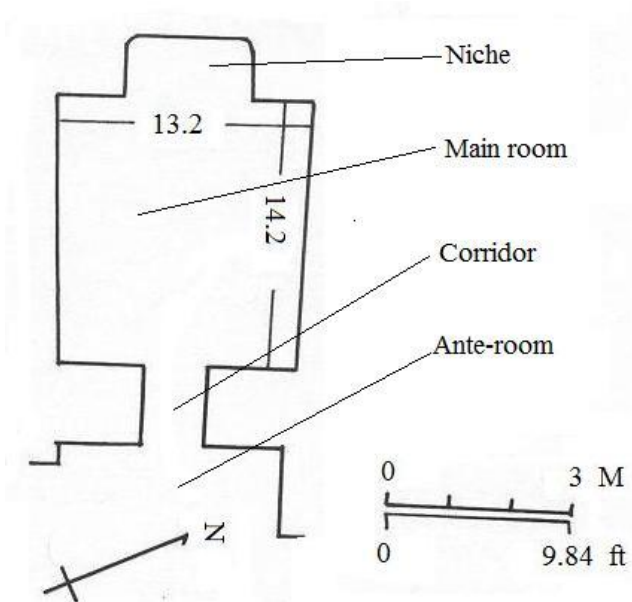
A floor plan of Cave 296, the Northern Zhou, Source: Shih 1996:74.
